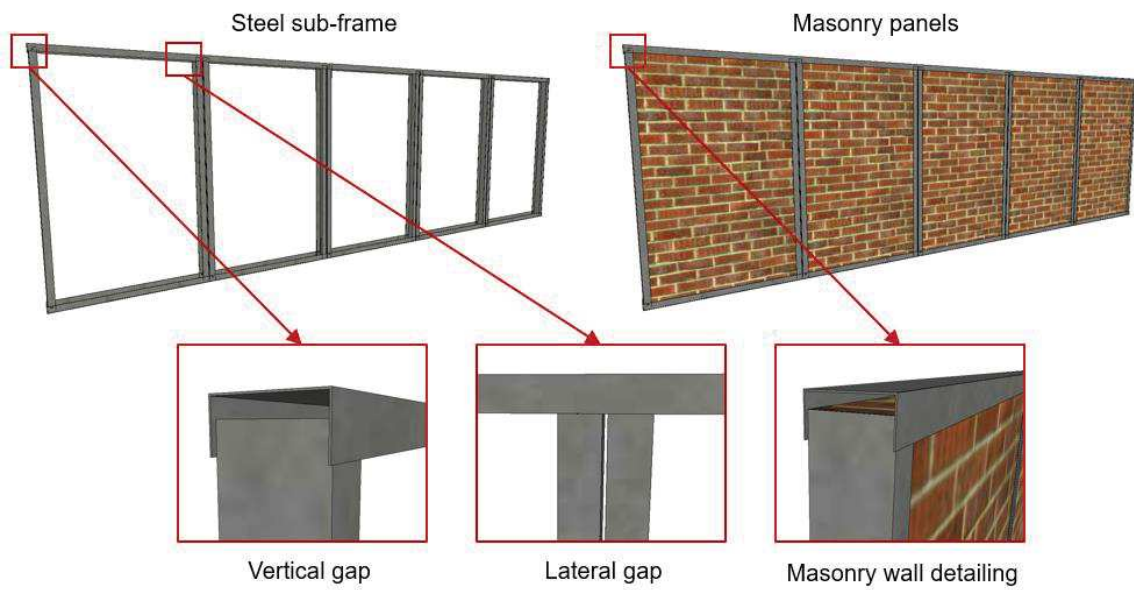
Detailing of the low-damage masonry infill wall.
